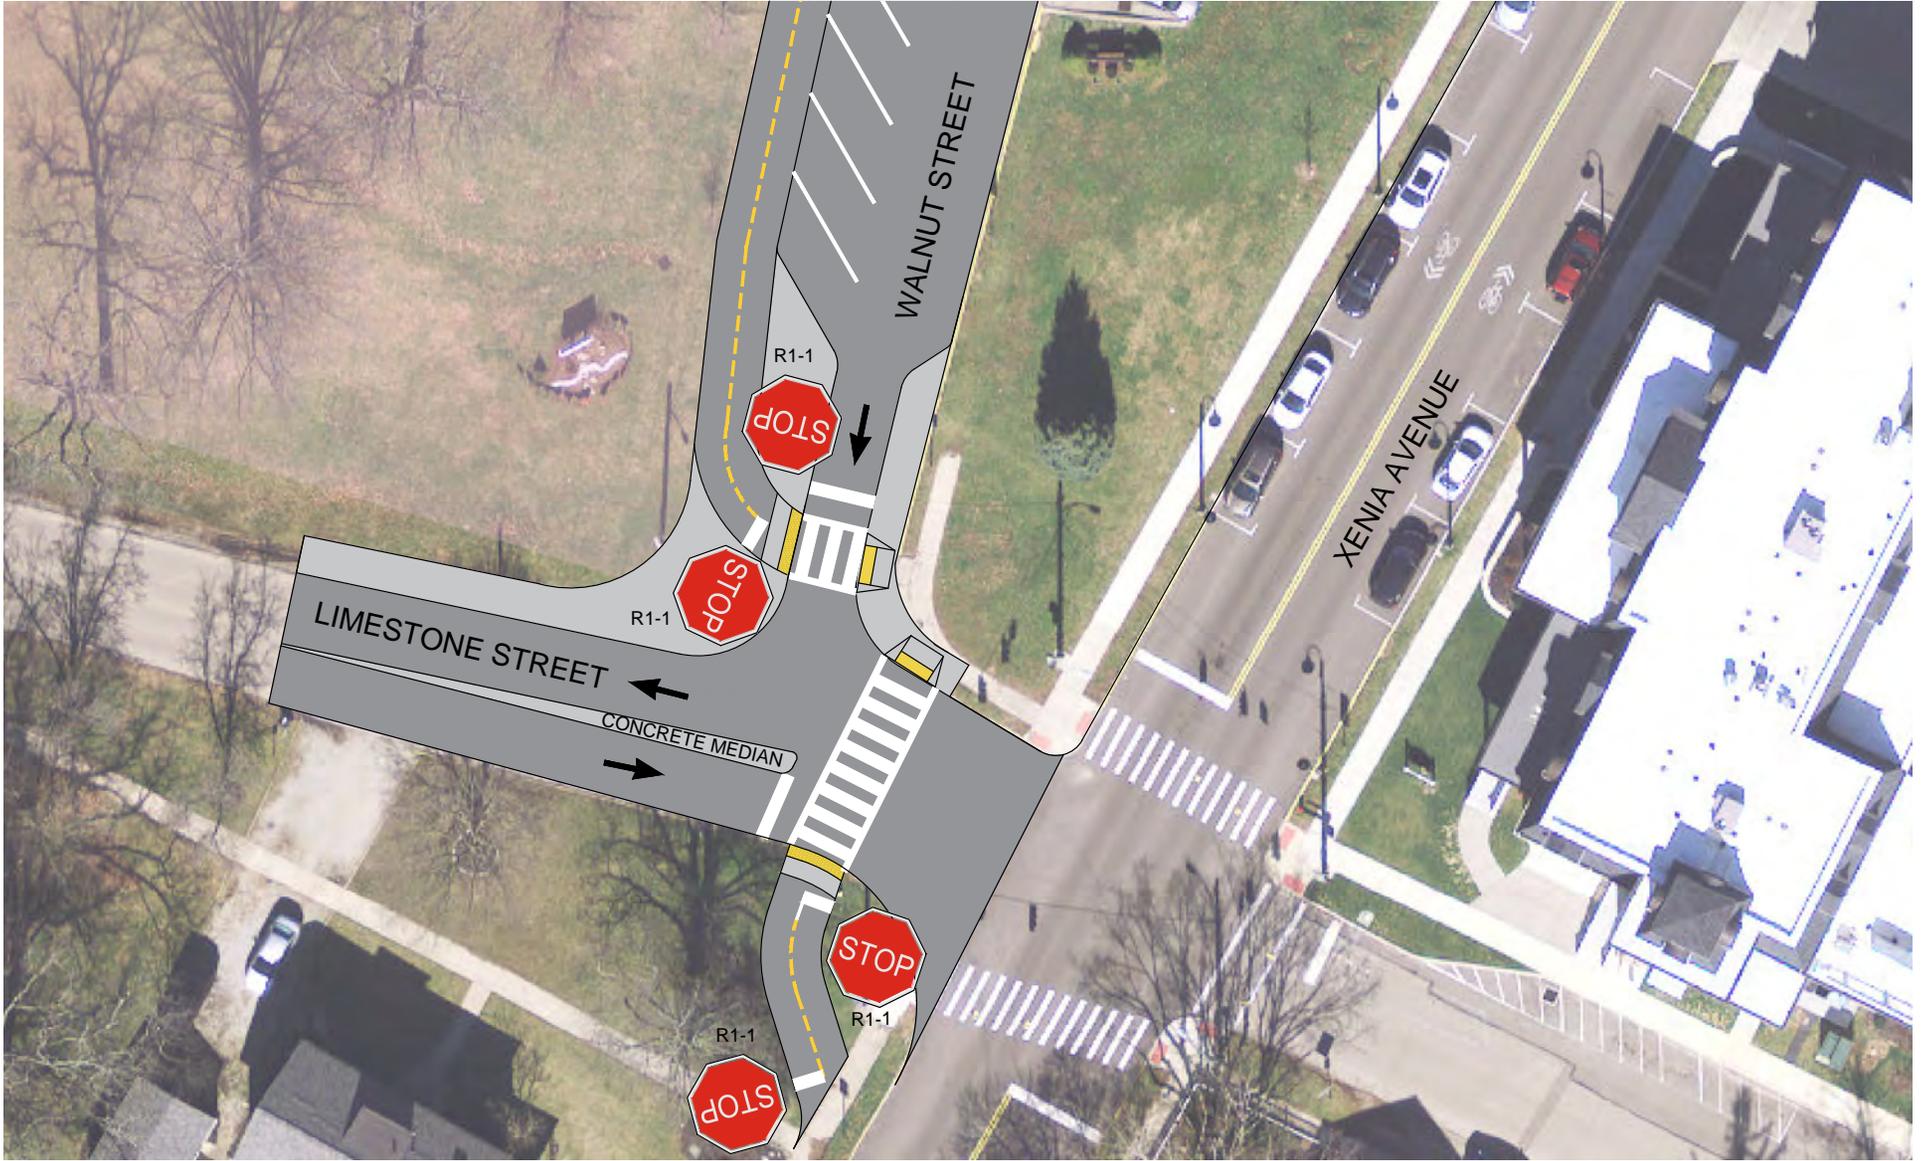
Walnut Street and Limestone Street Traffic Calming (S-13) and Walnut Street Shared Use Path (L-20)
